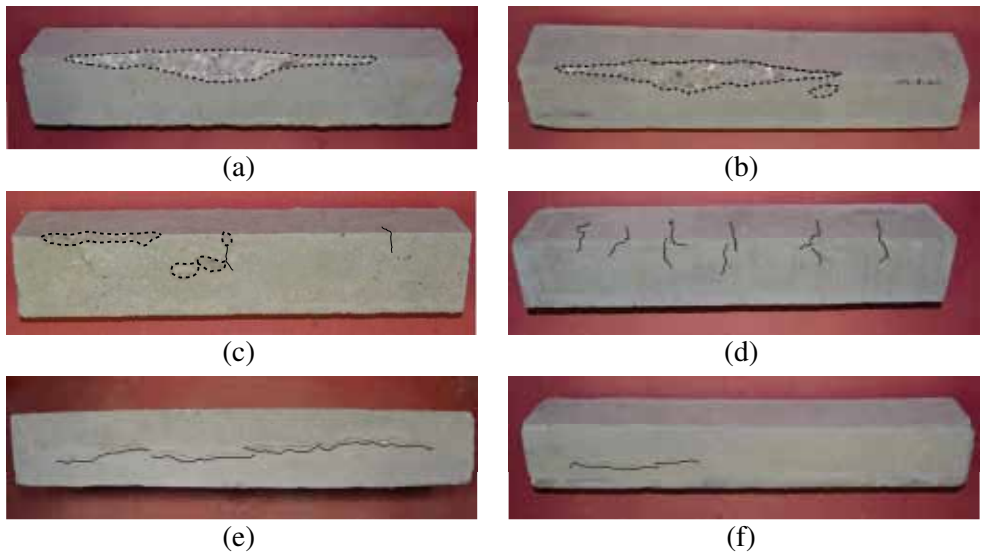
Typical damage in unreinforced (a,c,d) and reinforced specimens (b,e,f): (a) severe spalling in Specimen NSC/P/W/1; (b) severe spalling in Specimen HPC/R/W/1; (c) light spalling with some indentation and scaling in Specimen HPC/P/W/2; (d) severe corner cracking in Specimen HSC/P/D/1; (e) fully-developed longitudinal cracking in Specimen NSC/R/D/1; and (f) partially-developed longitudinal cracking in Specimen NSC/R/W/1.
